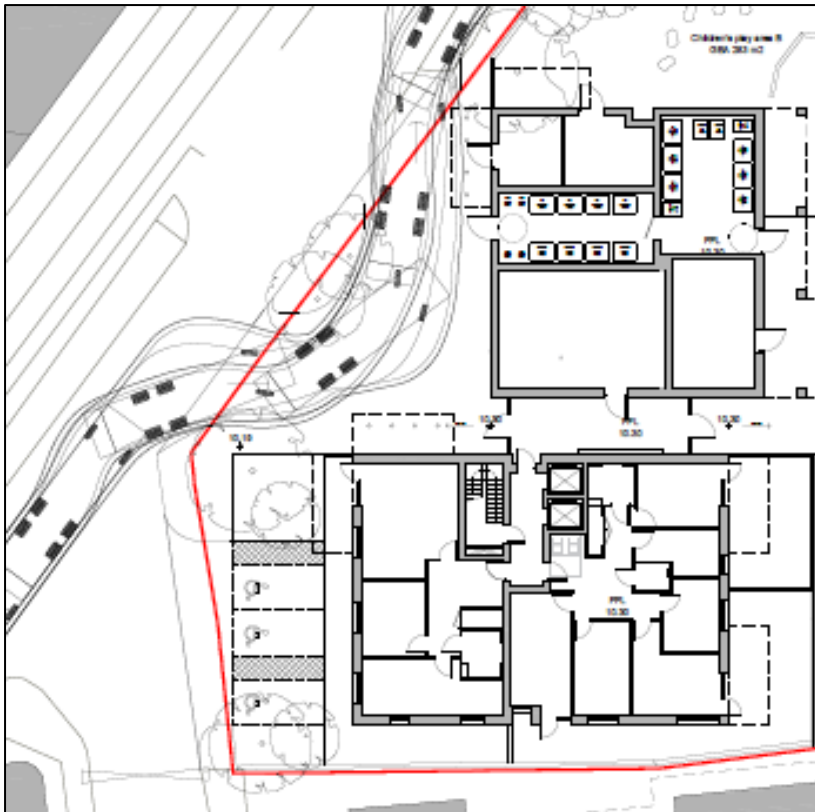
Proposed Ground Floor Layout - Servicing Arrangements
